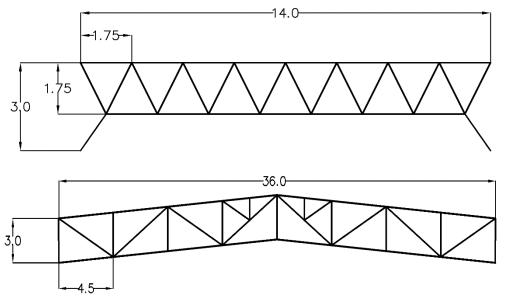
Layout of the bracing truss (upper) and main truss (lower); (Dimensions in [m])
